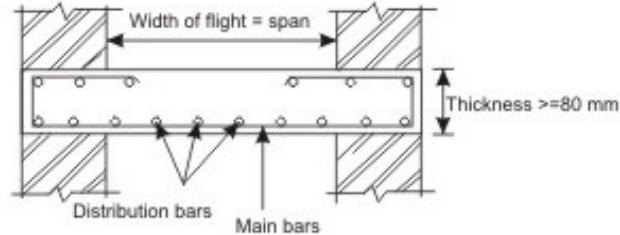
(a): Slabs supported between two stringer beams or walls
